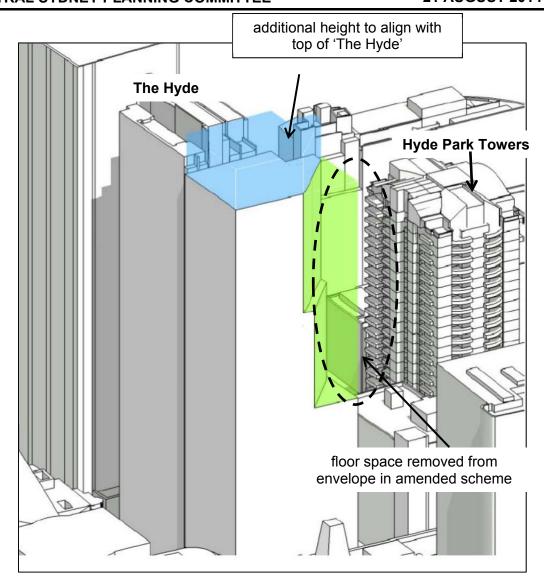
Proposed building envelope looking southwest, illustrating proposed chamfered corner and additional height where floor space is to be redistributed
